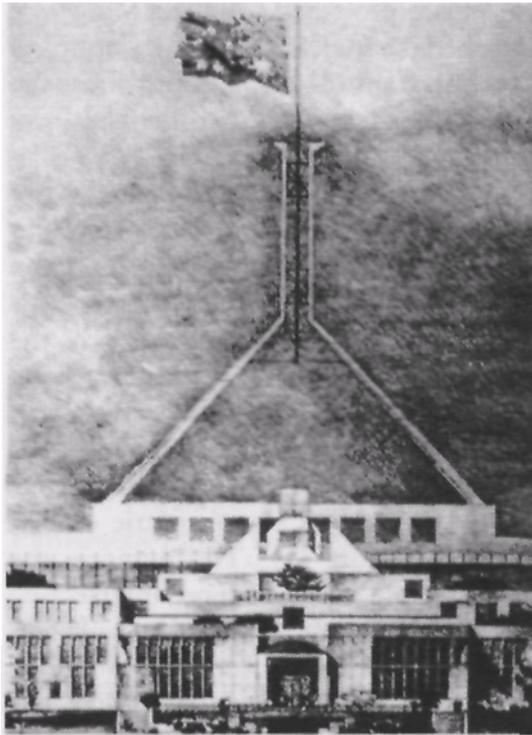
Elevation of new Parliament House, Canberra, showing flagpole
